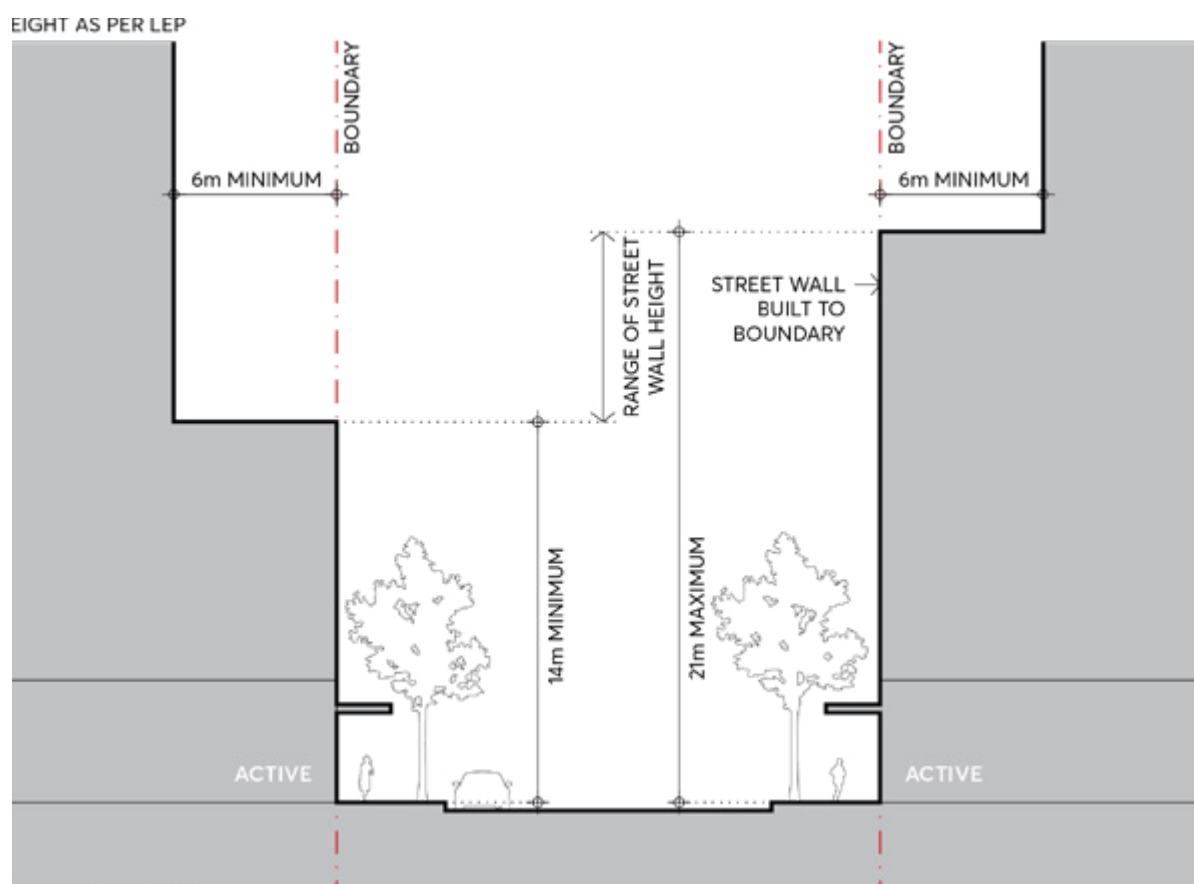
Street Setbacks and Street Wall Height – Active Ground Floor Street Frontage
